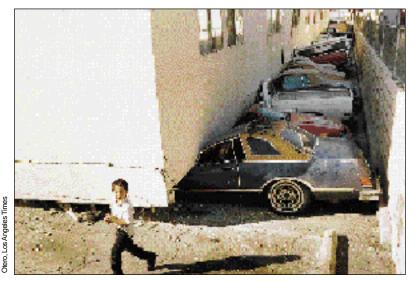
Older apartments like this with tuckunder parking collapsed because they were poorly braced.
